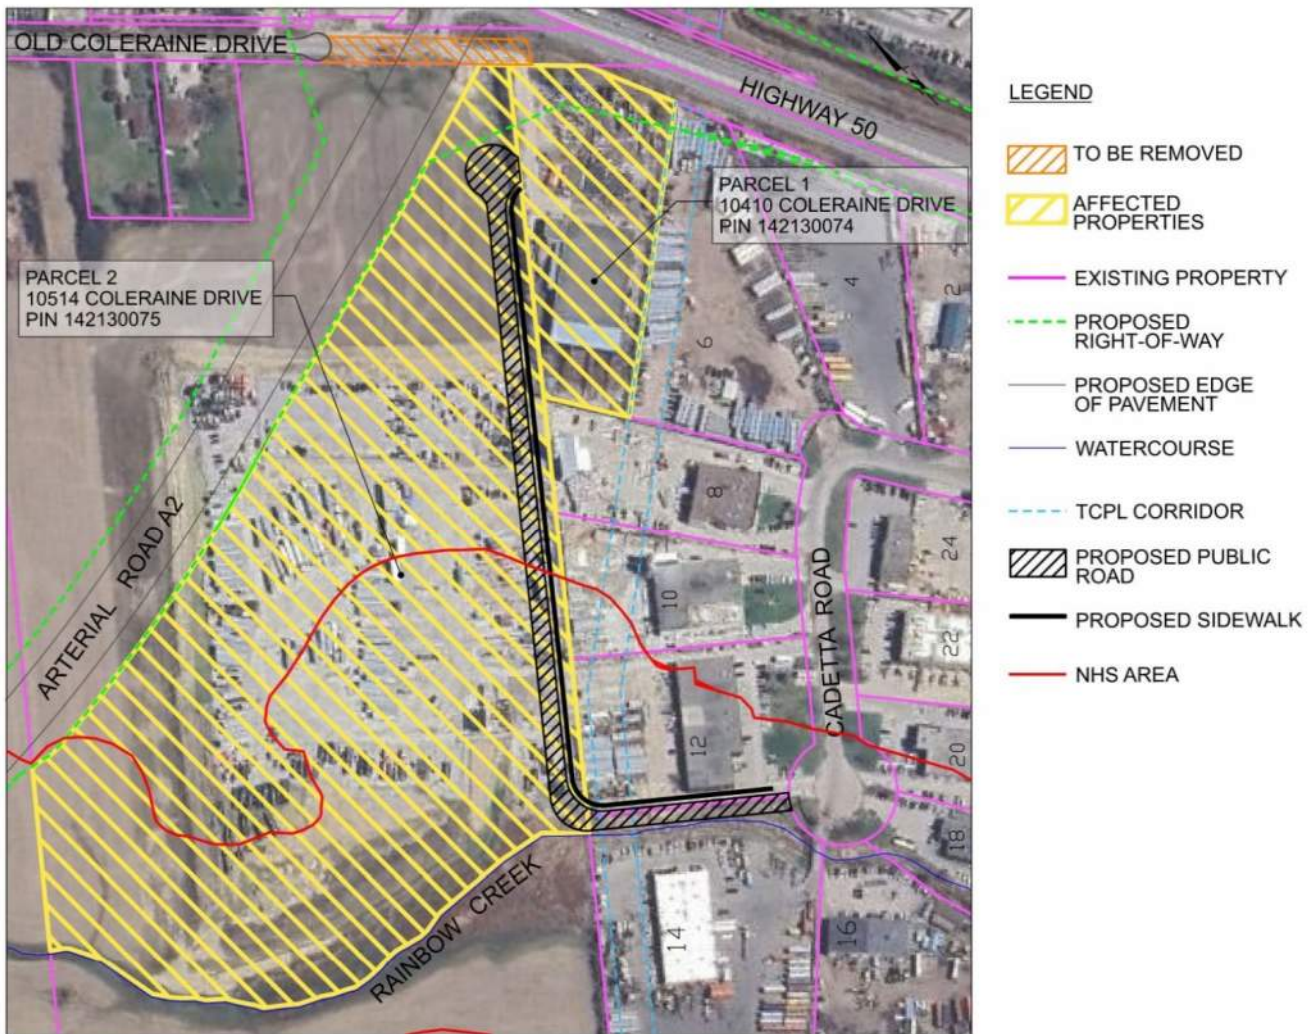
Options 7A & 7B Extension of Existing Public Road at Cadetta Road Cul-de-sac
